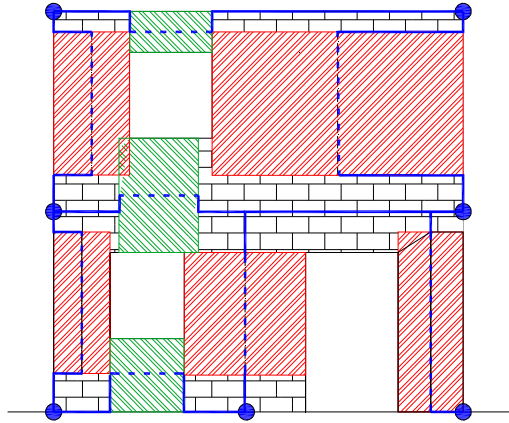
Example of macro-element modeling of a masonry wall (piers in red and spandrels in green).
